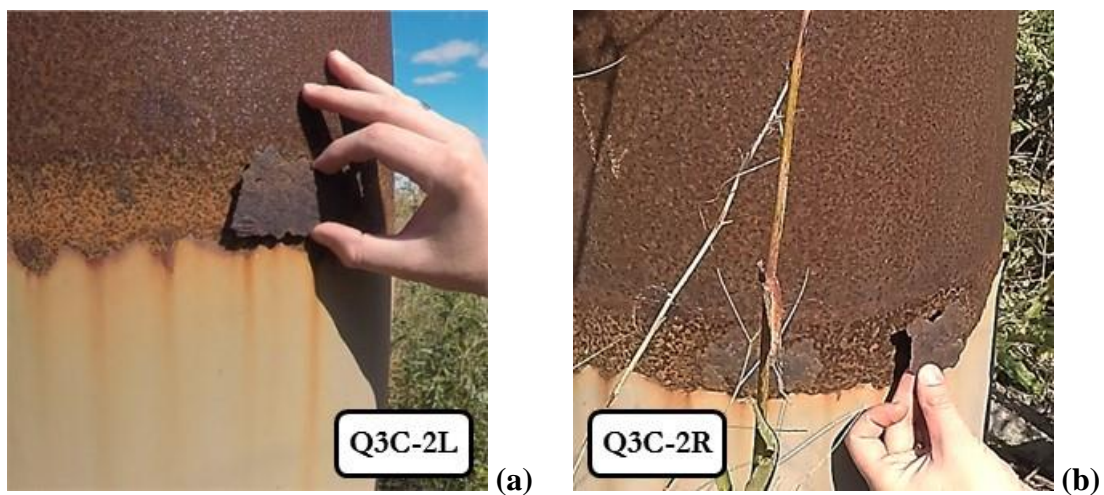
Pack-out corrosion damage: (a) rust removed from coating line; and (b) easily removed rust layer, with pack rust still visible along coating line.
